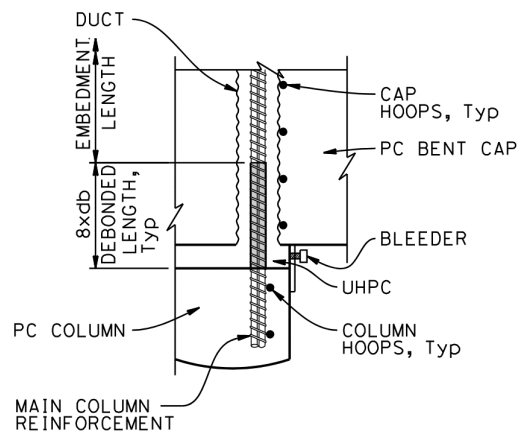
Grouted Duct Connection Detail with Rebar Debonding
